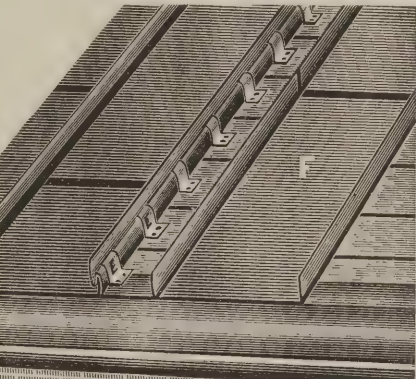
Section of Roof Covered with Roll Cap Steel Roofing.
